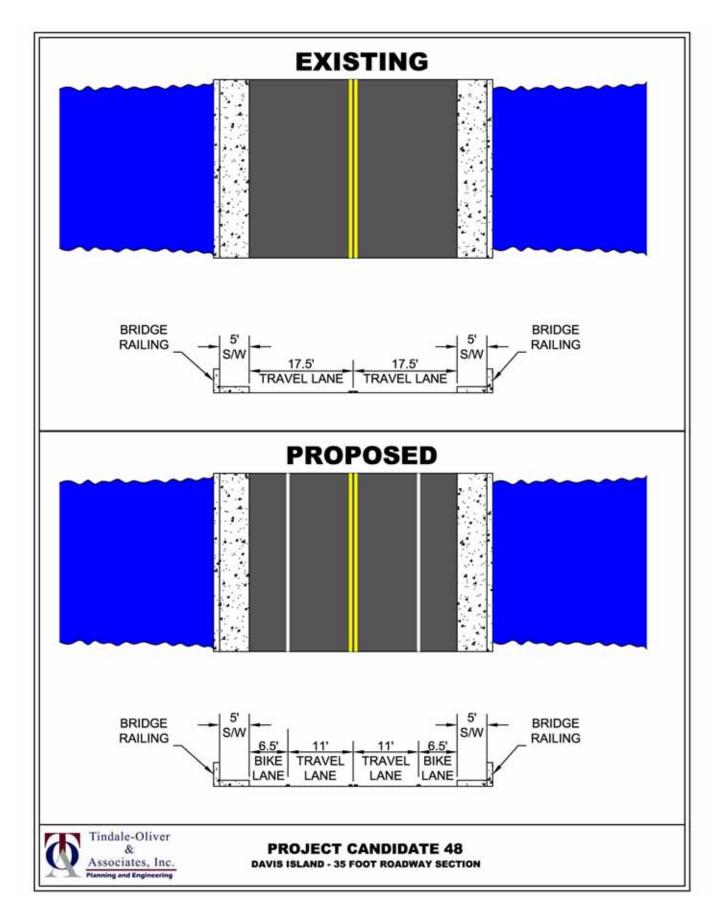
A: Davis Island Proposed Improvements – 35-foot Roadway Section
